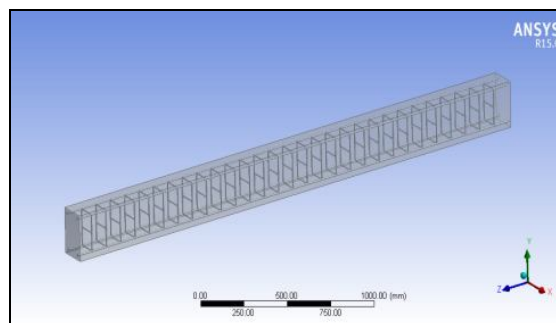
RCC beam 100mm bar spacing with cellular stirrups
